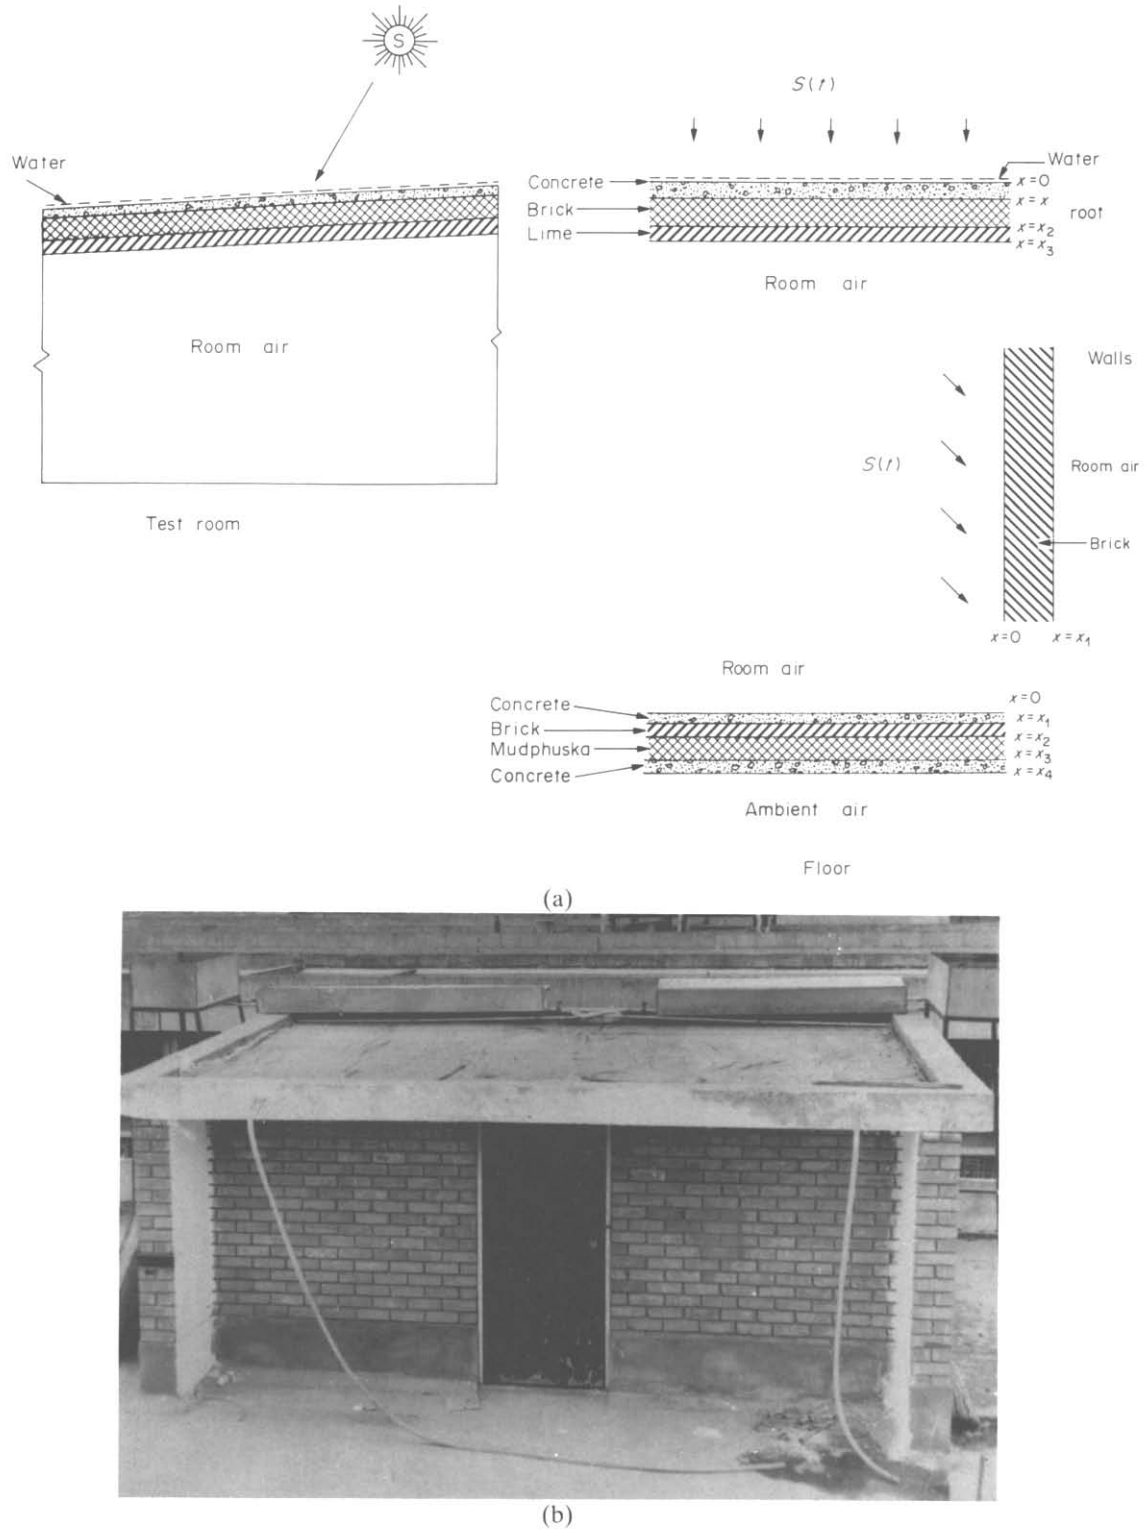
(a) Schematic view of the room, roof, walls and floor. (b) Photographic view of the roofs with and without cooling system.
